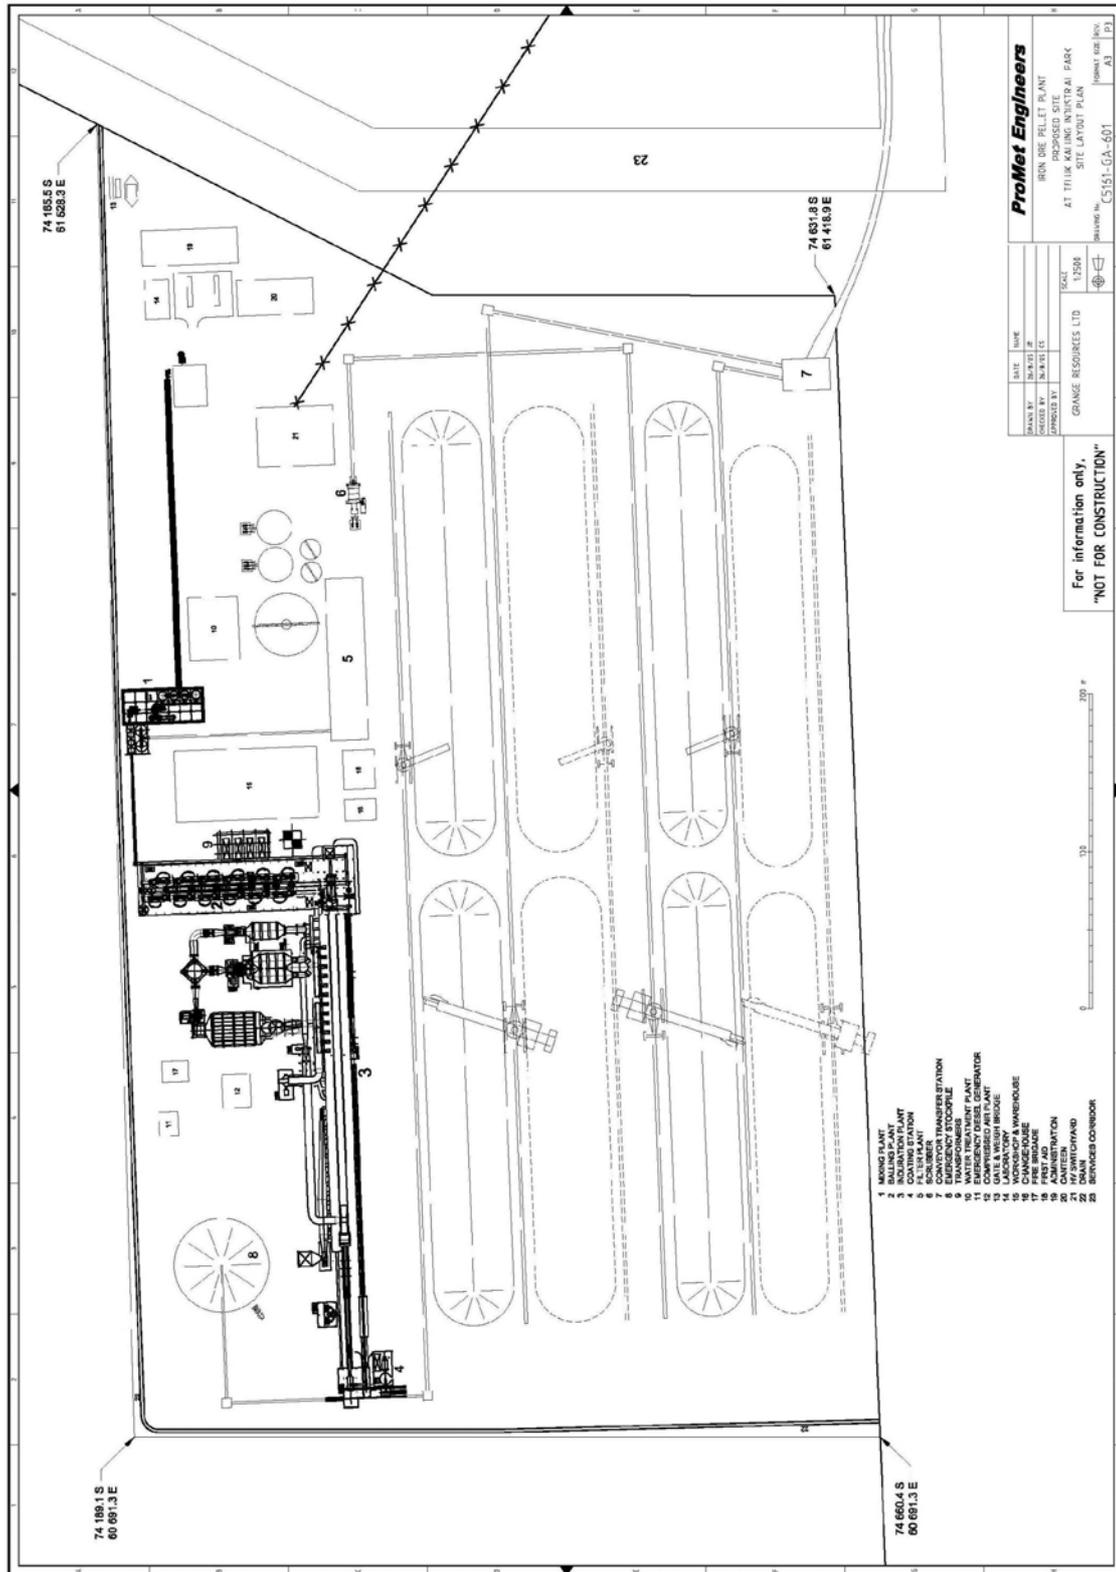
Kemaman - Proposed Processing Facilities Layout Plan
